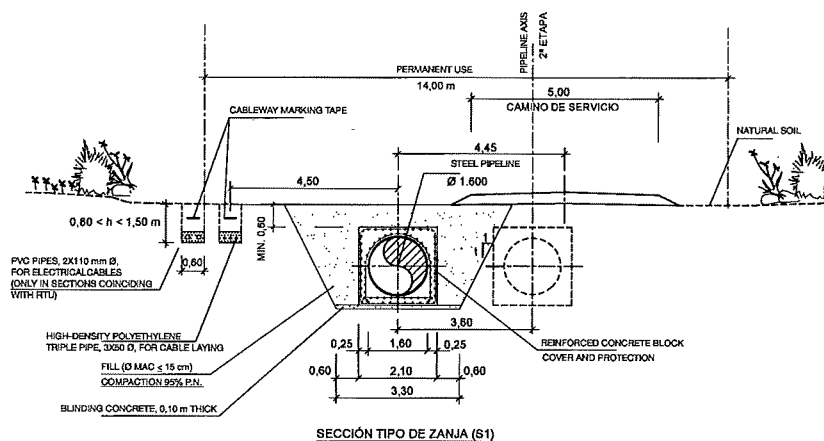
Characteristic cross-section in trench with concrete block (BR 3)
